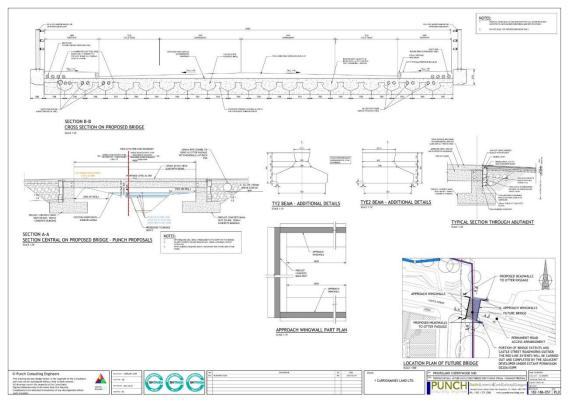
Proposed future Castle Street bridge over Ticknick Stream – Permanent Proposal
